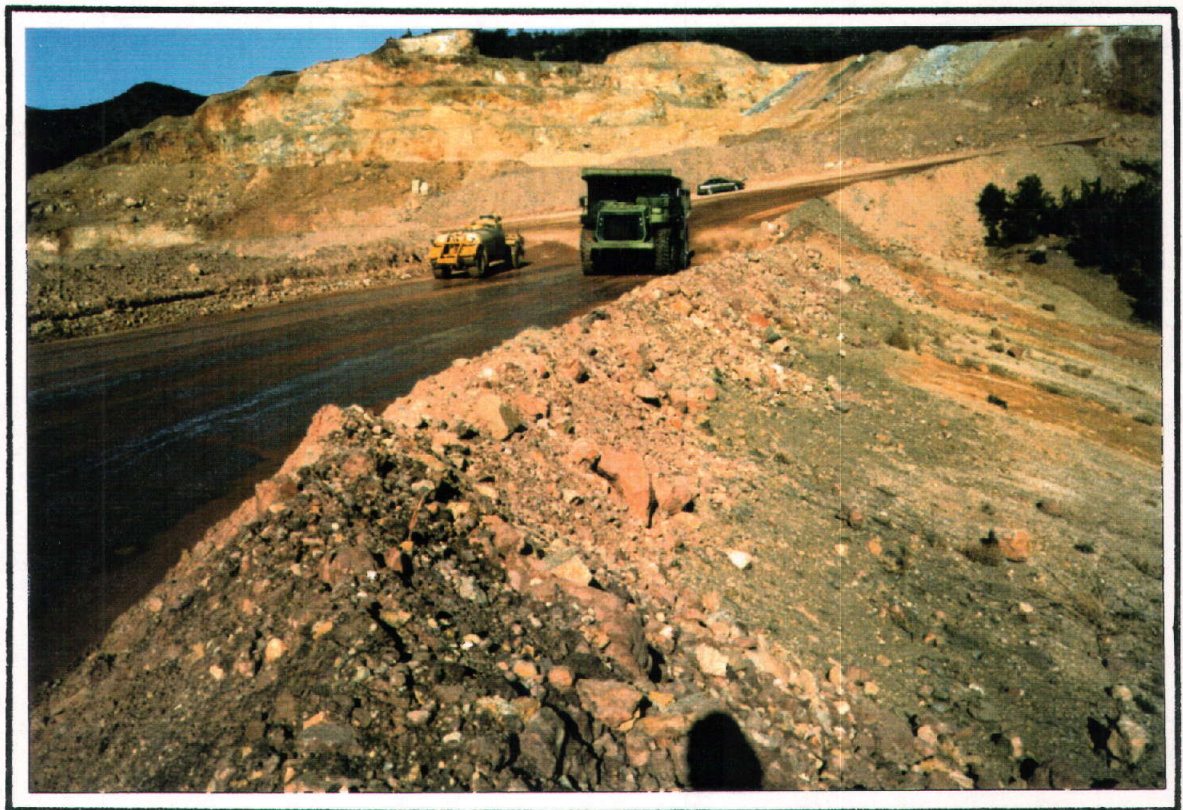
CREST OF DAM, CURRENTLY USED AS HAUL ROAD.
